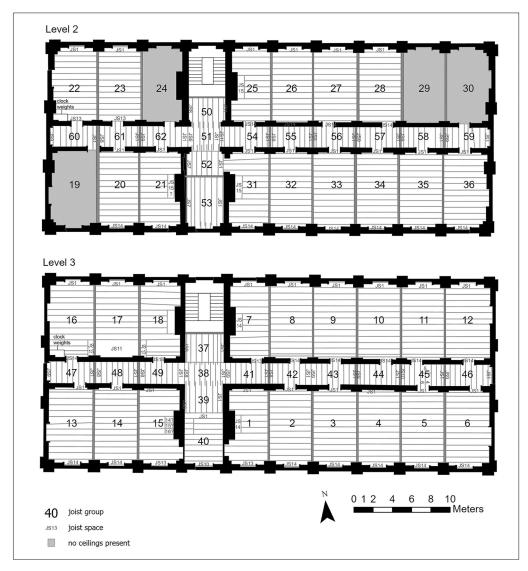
Layout and numbering of the underfloor spaces on levels 2 and 3 of Hyde Park Barracks (figure by author).
